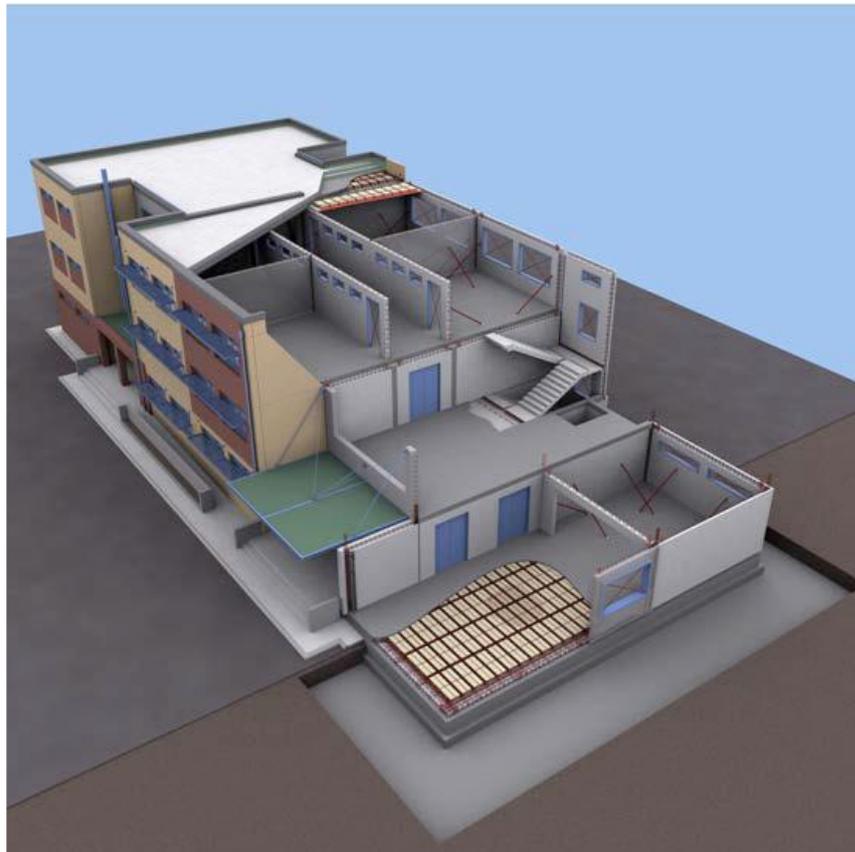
Precast wall System (Hernandez and Cladera, 2011)
